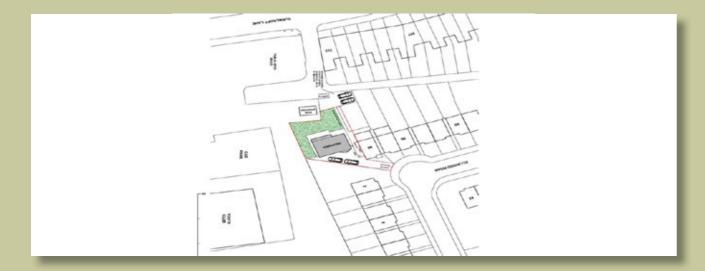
DETAILS AVAILABLE PLANNING REFERENCE: DC/083916
